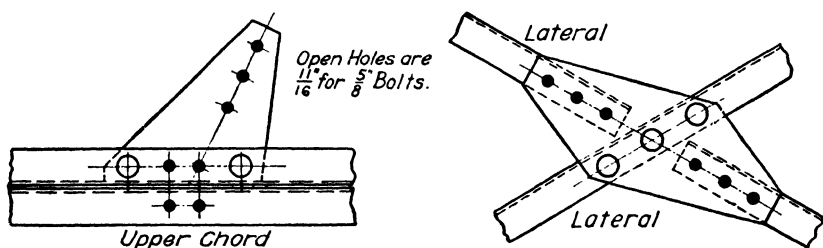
DETAILS OF LATERAL BRACING FOR THE TRUSS OF FIG. 160.
